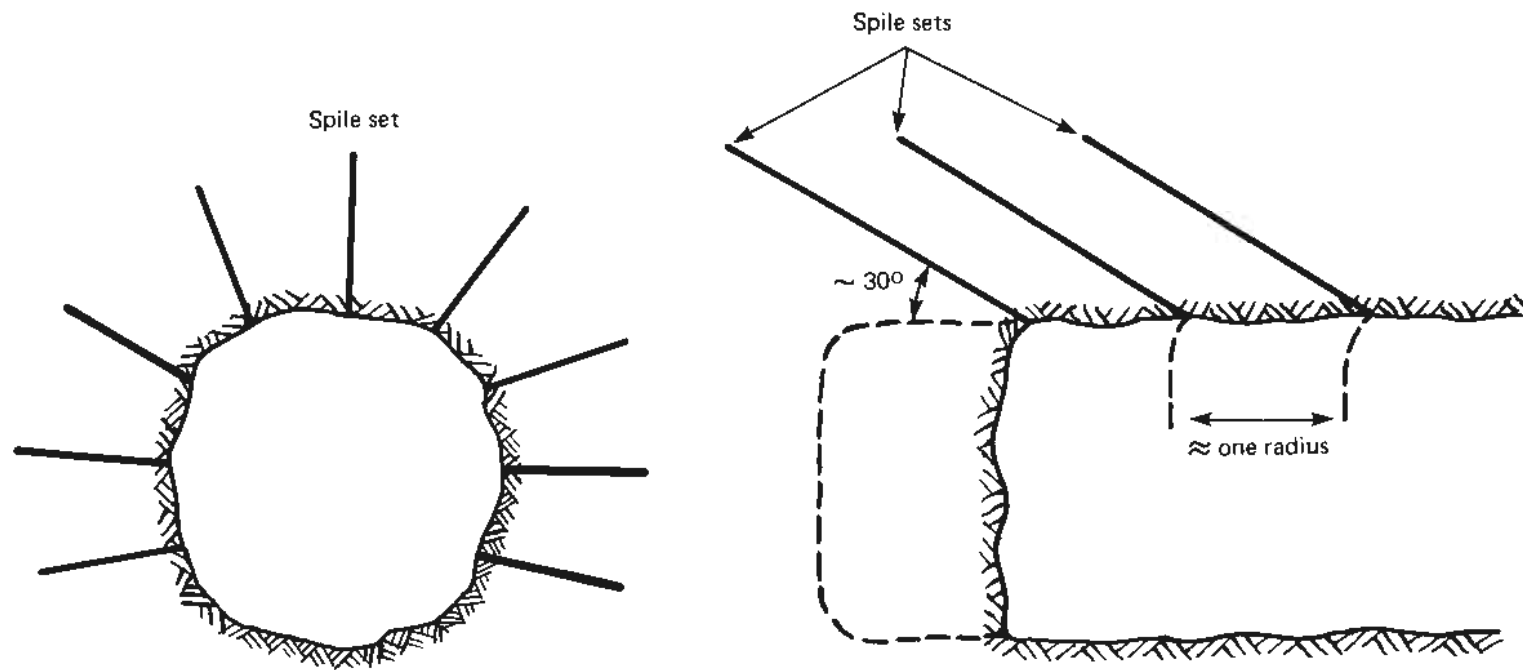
SPILING REINFORCEMENT AHEAD OF TUNNEL FACE
